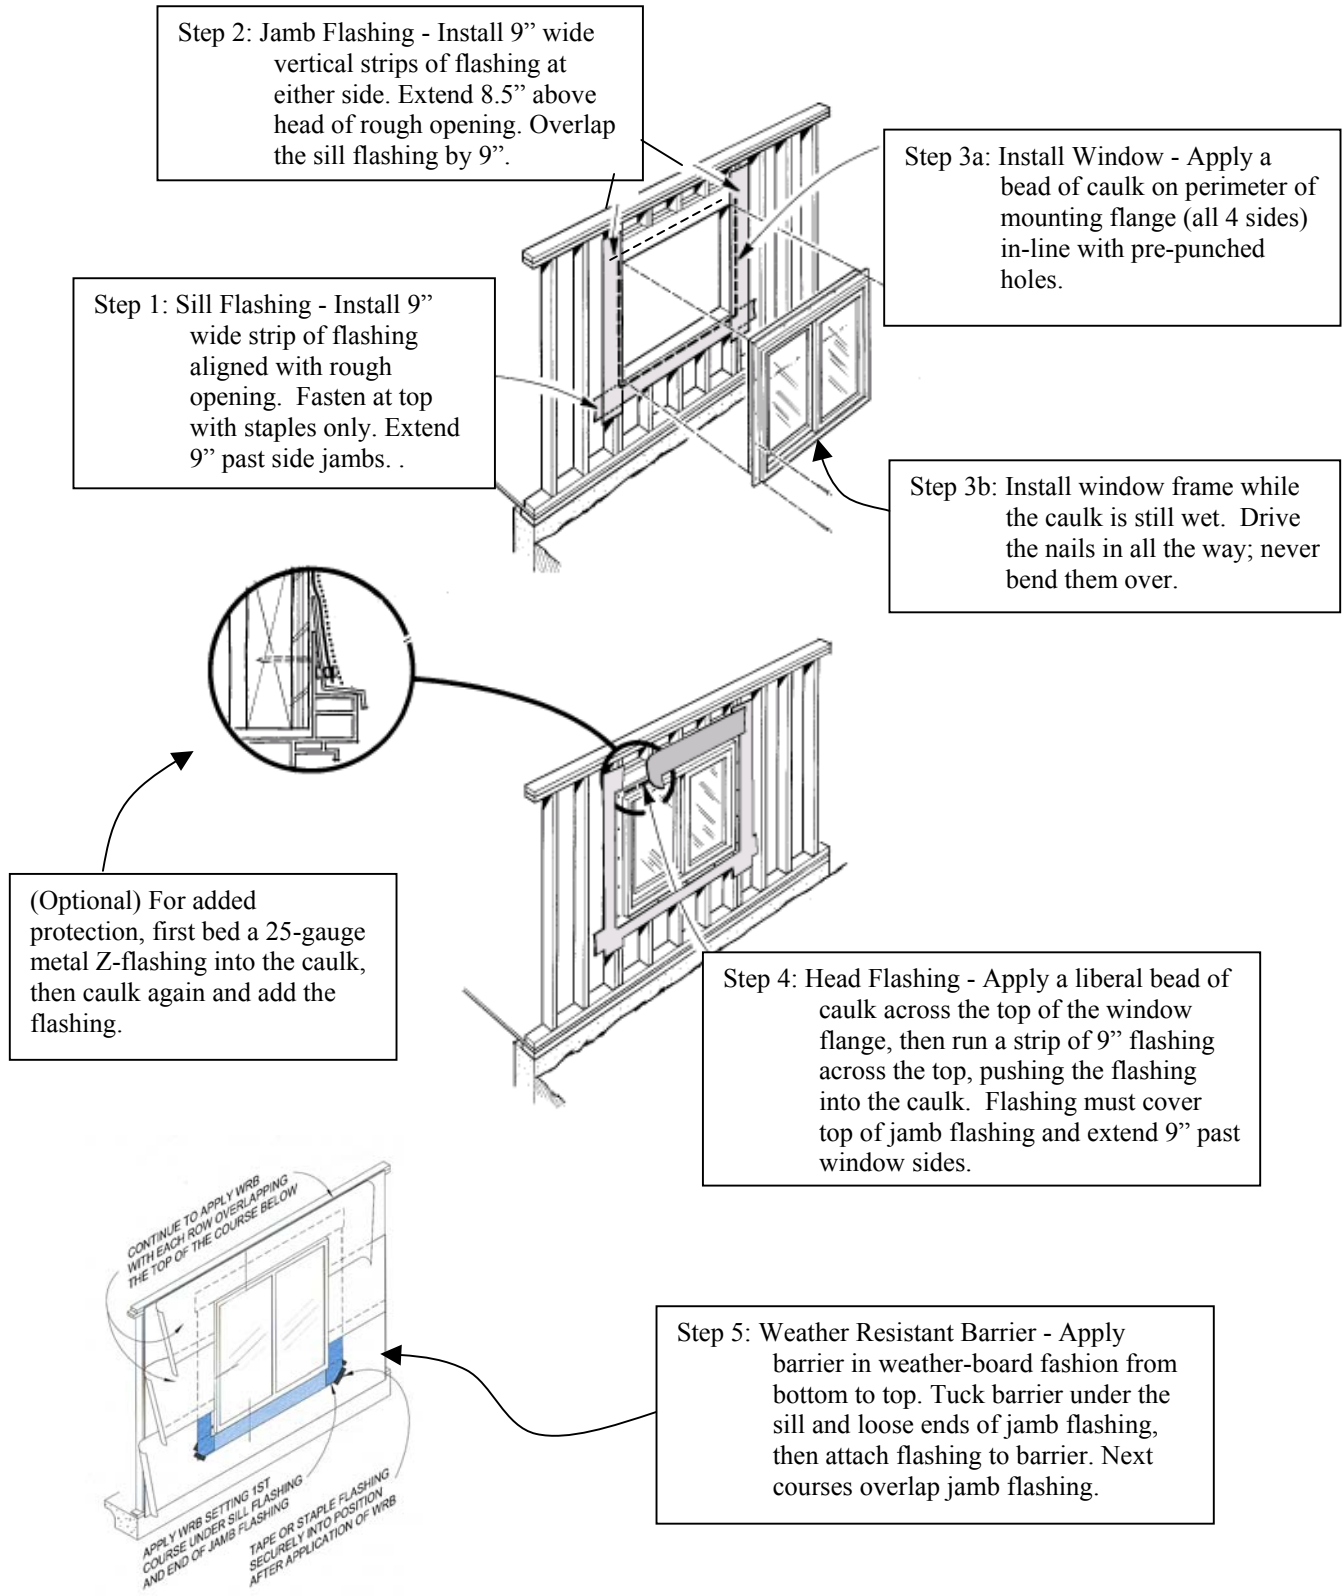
Water Penetration Resistant Window Flashing Details (diagram provided by AAMA).
